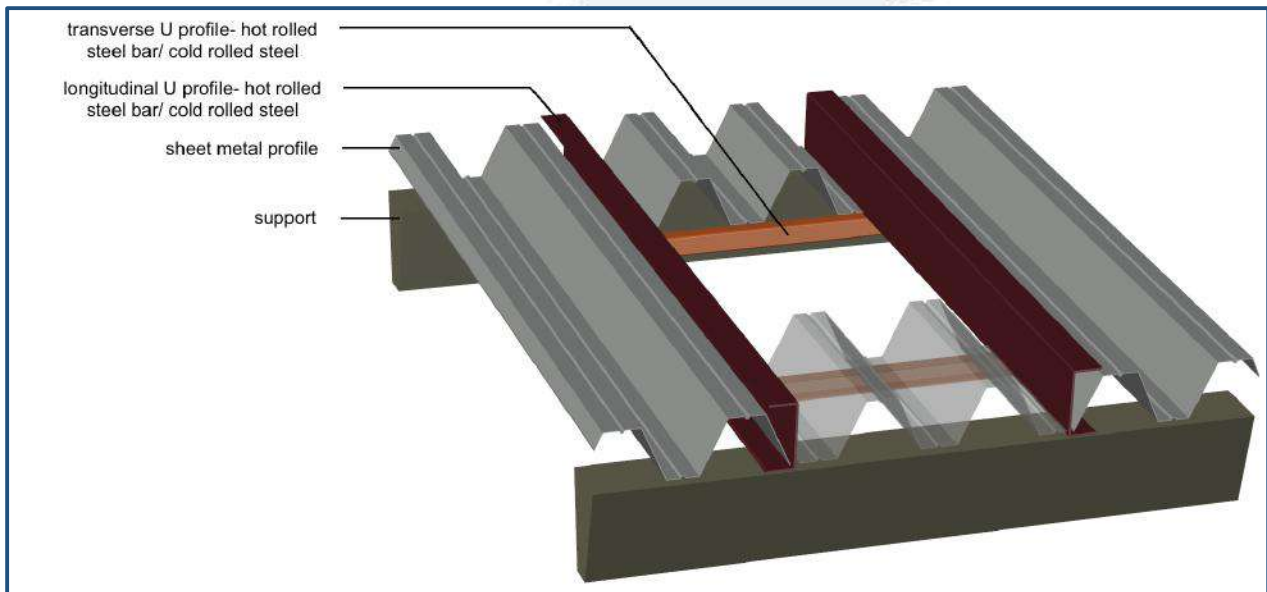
Scheme for reinforcement - above, installation before the trapezoidal sheet
